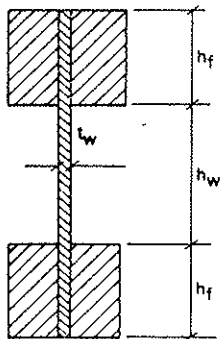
333 — Beam with timber flanges and sheet material web.
